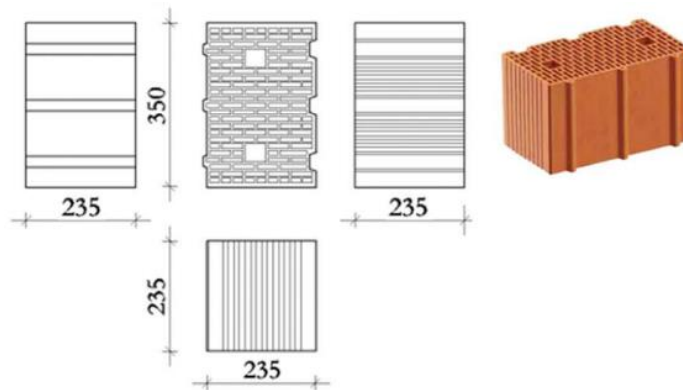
Detail of Masonry Unit for Specimen TA2 (measured in mm) [30]
